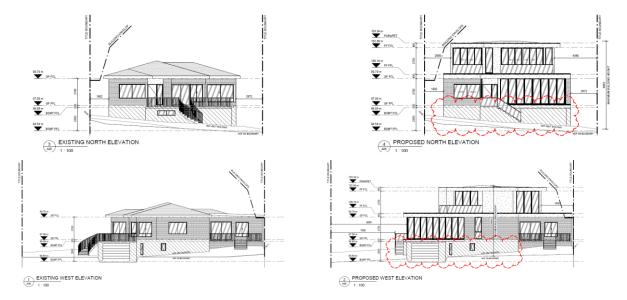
Elevations north, Leyland Road above and west, Kingston Street below.
